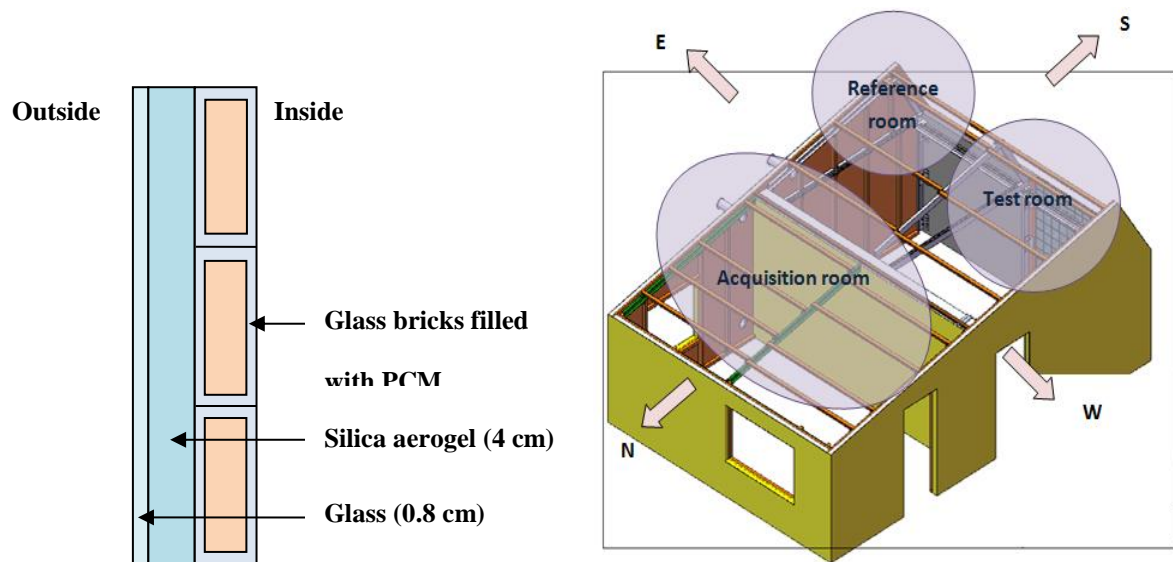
Layout of the PCM-aerogels solar wall and schematic presentation of the test building
